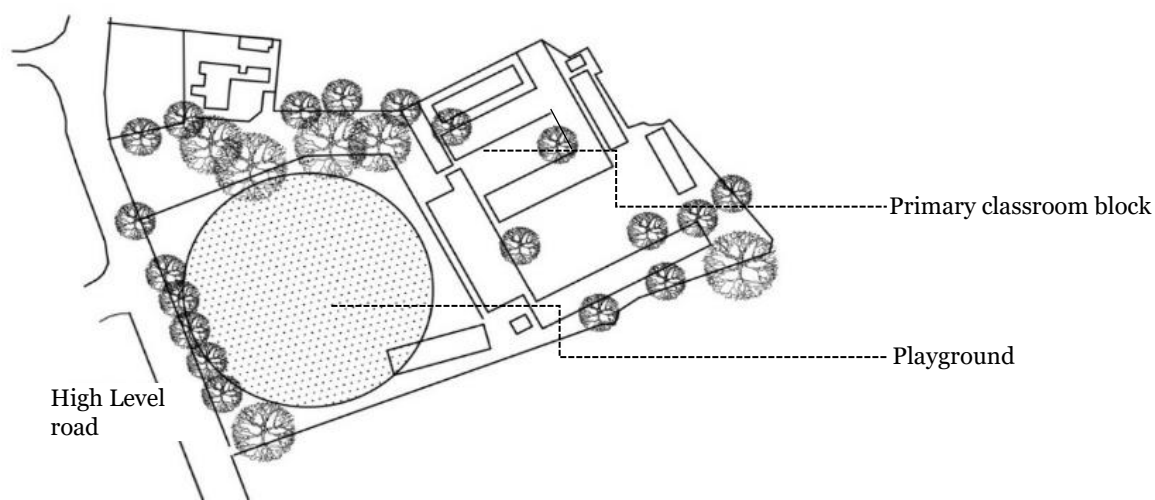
Master plan of Thurstan College and surrounding environment of primary classroom block
